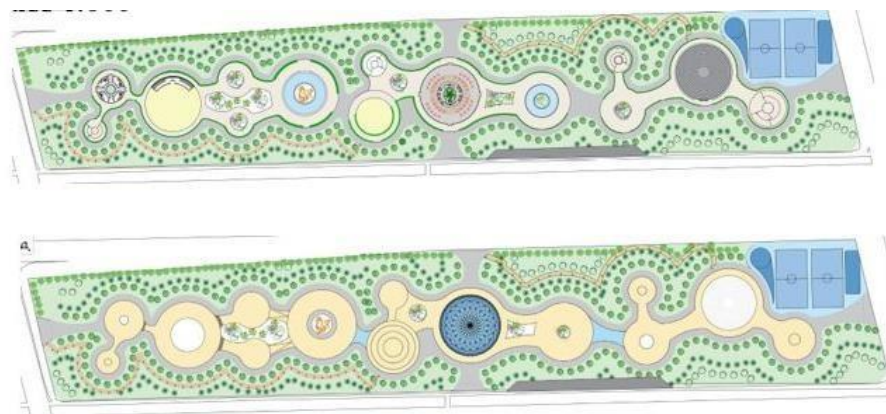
2D Plans (ground and first level) Proposed Redesign of Qutabyan Park
